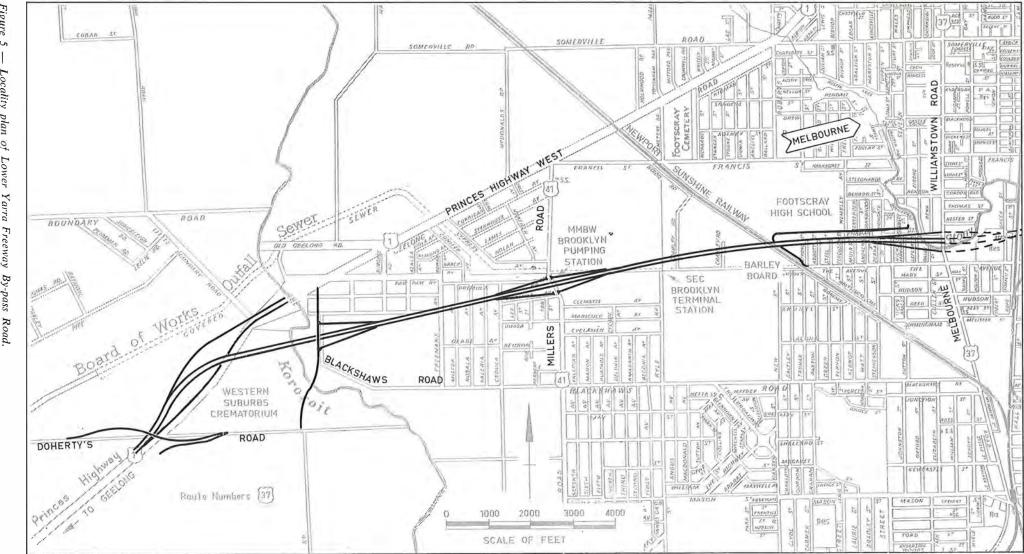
Figure S Locality plan of Lower Yarra Freeway By-pass Road.
